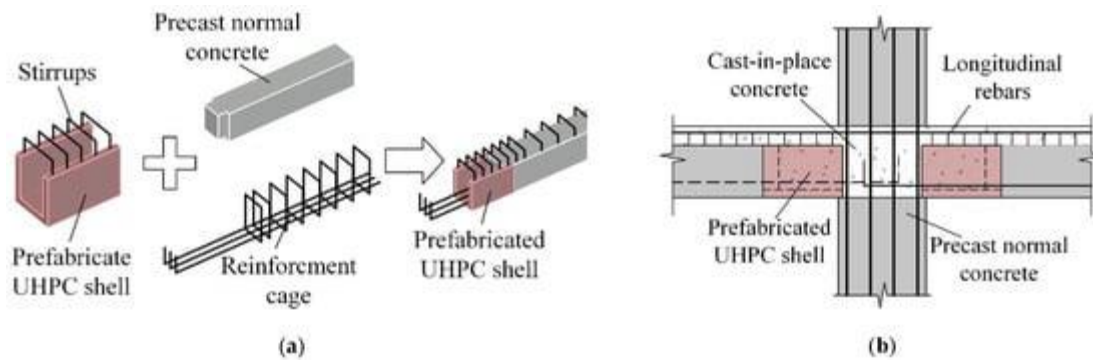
Schematic of the novel precast beam-to-column connection. (a) Precast beam, (b) connection.
